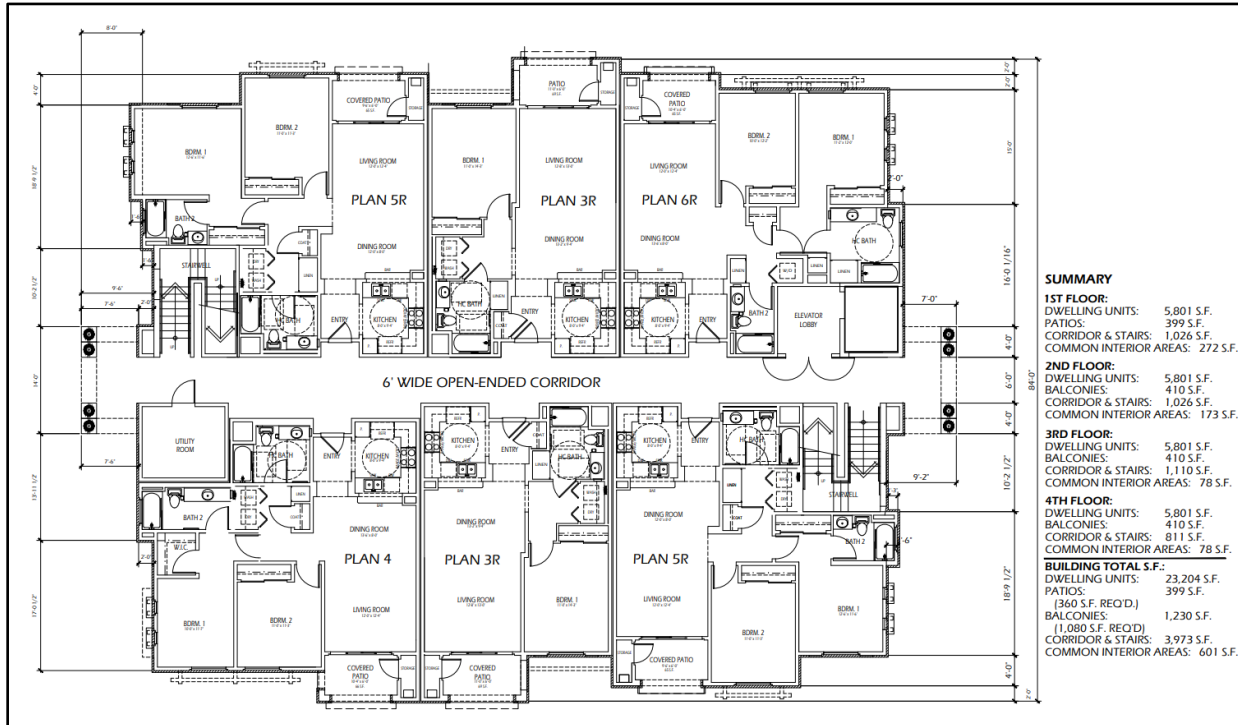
Exhibit G: BUILDING 2: FIRST FLOOR PLAN
